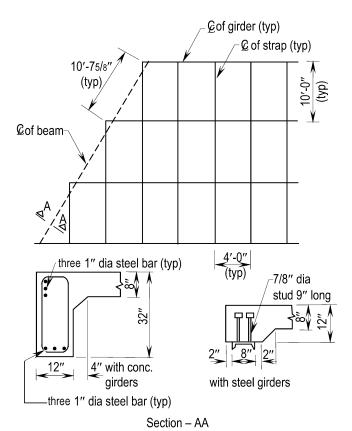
Details of edge beams. (Note: 1 in. = 25.4 mm.)
